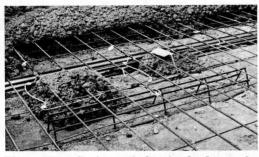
Instrumented standard mesh reinforcement with corrugated crack former.
